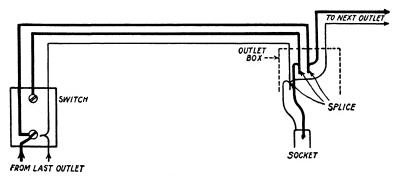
• Method of Wiring When Current Is Fed from Switch to Outlet and on to Next Outlet
